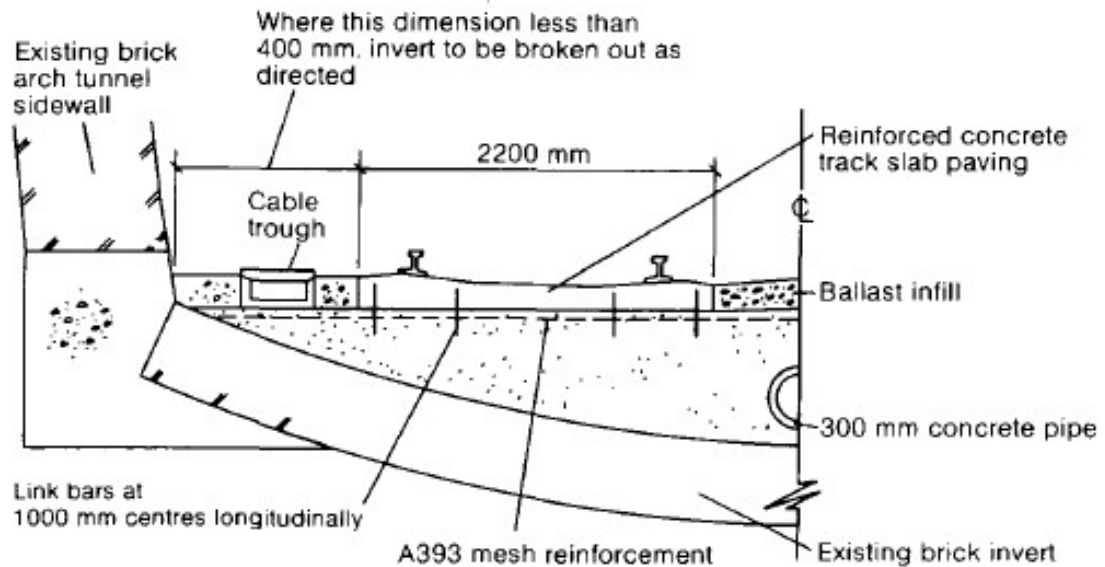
Tunnel structure with brick invert (Stevenson, 1987)
